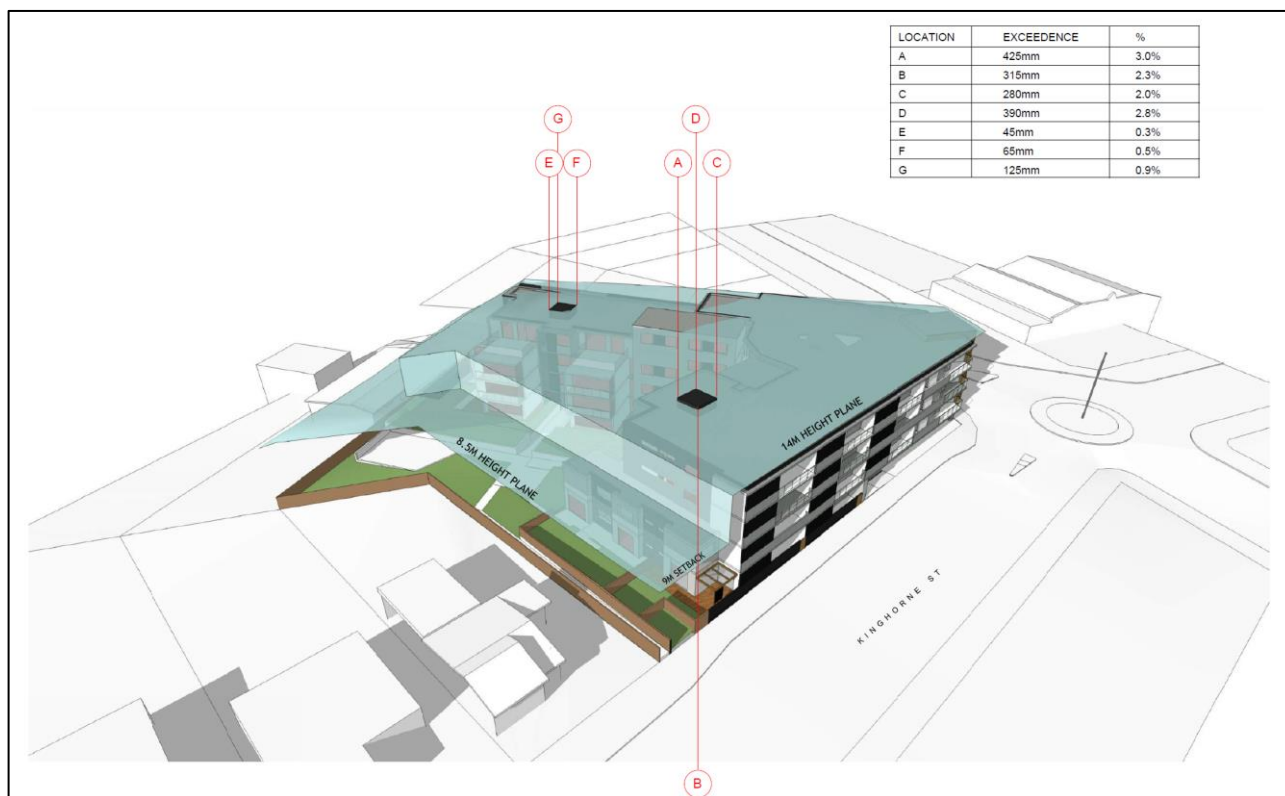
Height plane instructions relating to the 14.0m (N2) maximum building height - south-eastern view from Kinghorne Street.
